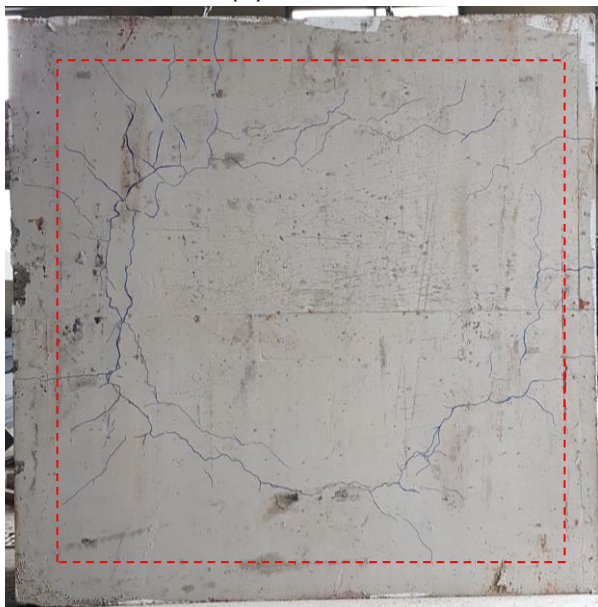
shows the crack patterns on the bottom surface of test specimens after the test. All the specimens can be seen that the punching shear failure occurred.
